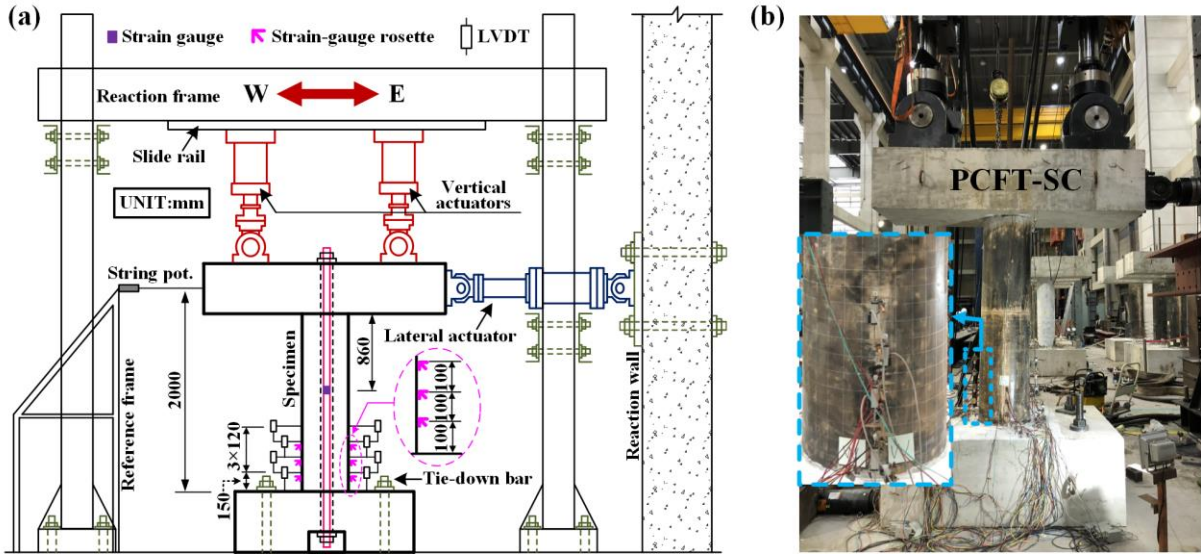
(a) Representation of the test set-up in elevation, (b) PCFT-SC specimen.
